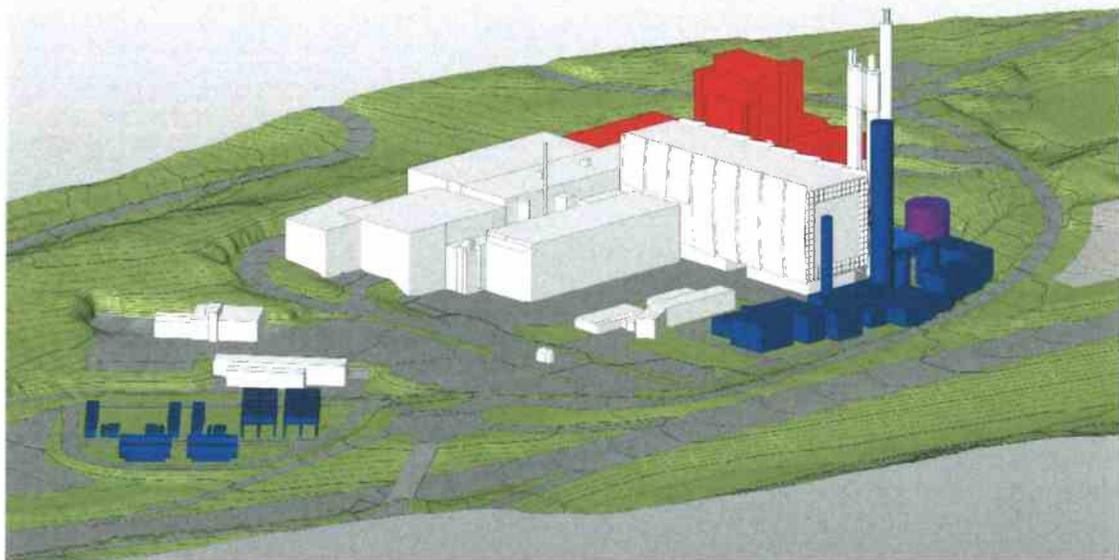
CC-plant at Klemetsrud WtE plant. View from south-east.
